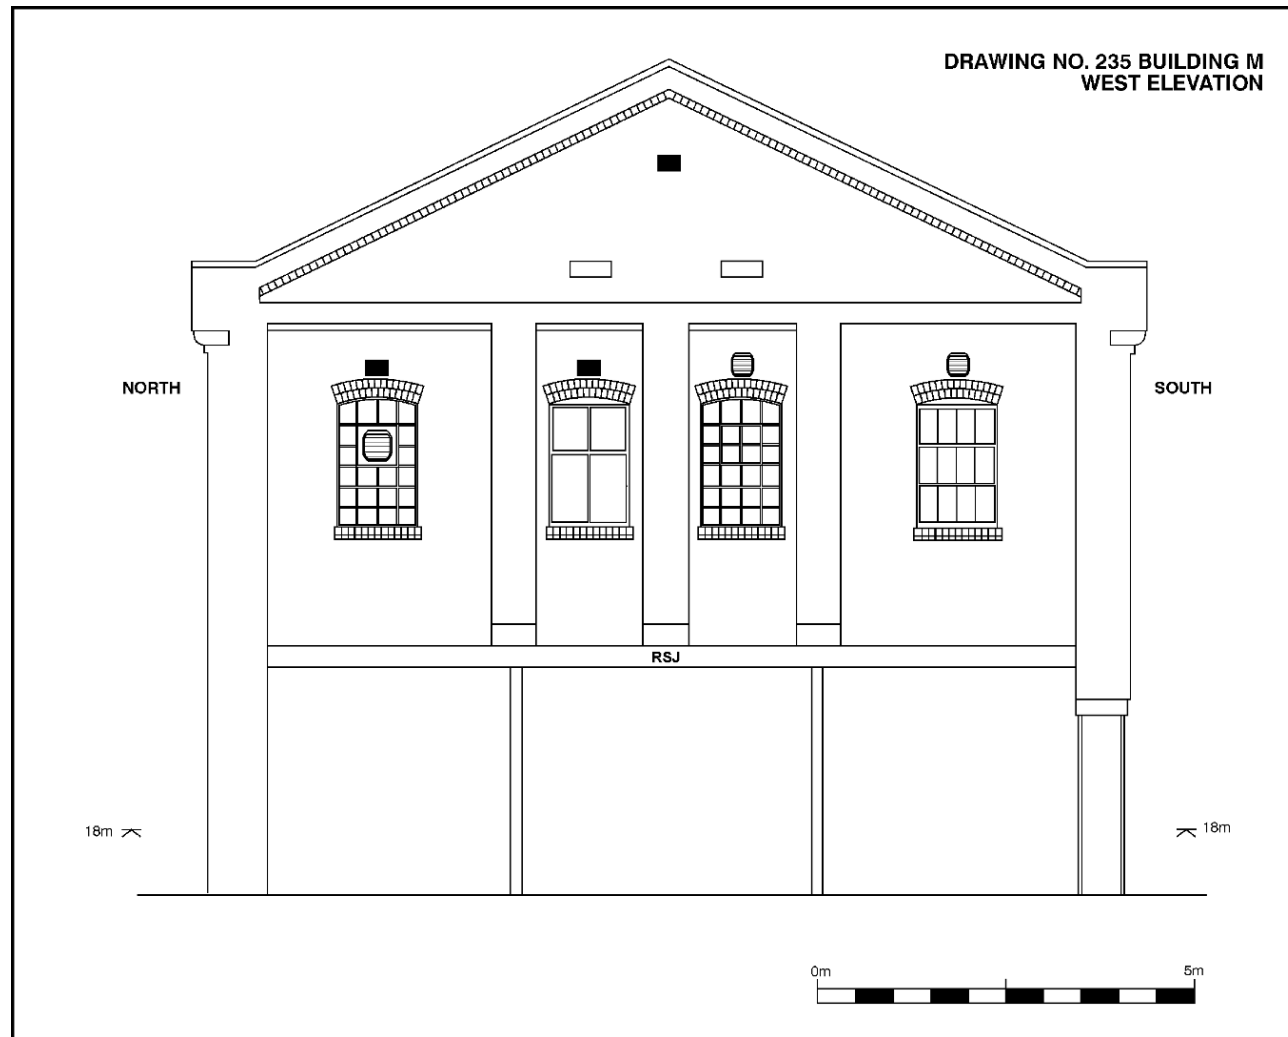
Survey drawing of the west elevation of Building M (scale 1:100)
